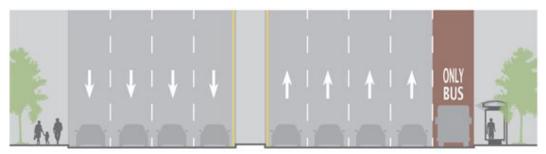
| Alternative 6 Cross-section of Boone Boulevard from Spring Hill Road to Chain Bridge Road
